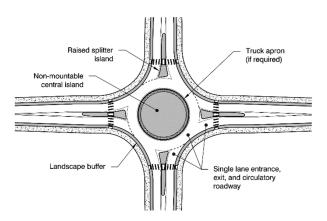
Single-lane roundabout layout design (Board et al., 2010)
